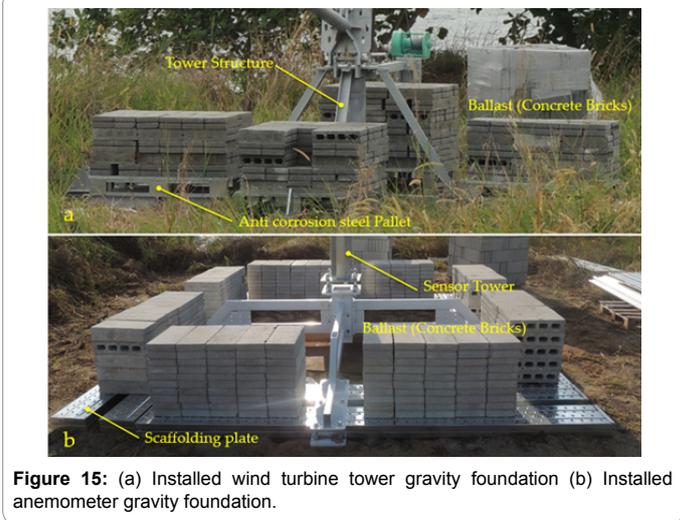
(a) Installed wind turbine tower gravity foundation (b) Installed anemometer gravity foundation.
